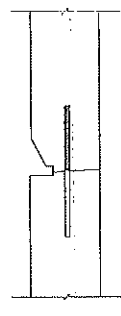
SECTION OF SHALLOW JOINT SPALLING
